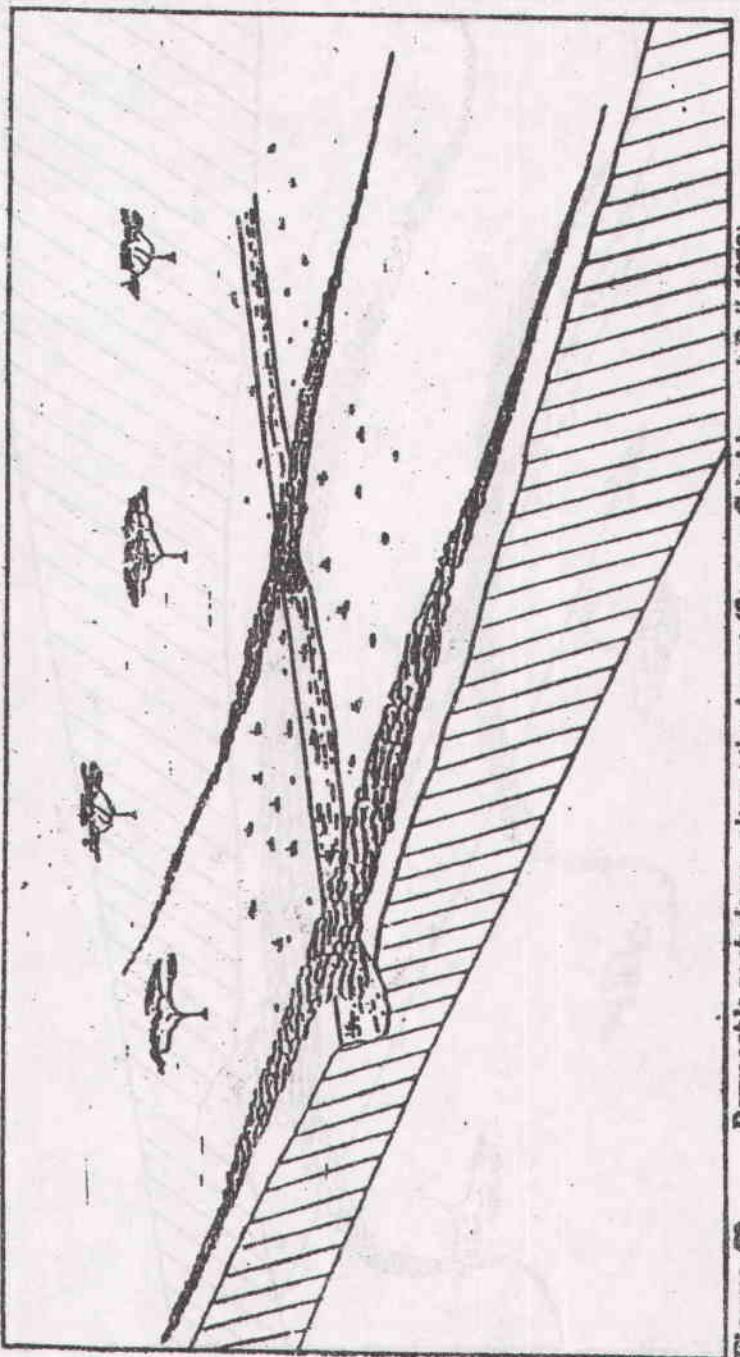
Permeable rock dams: alternative layout (Source: Critchley and Reij 1989)
